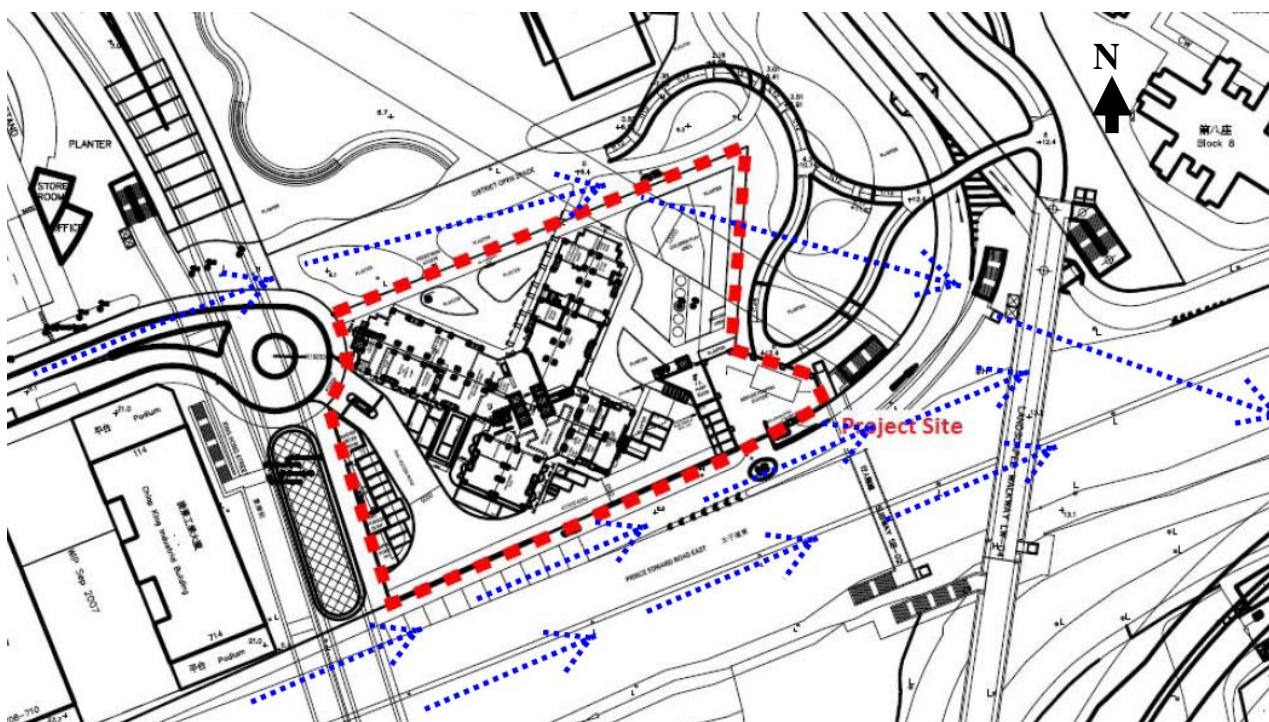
building orientation to enhance prevailing SW wind penetration from the south part of project site
